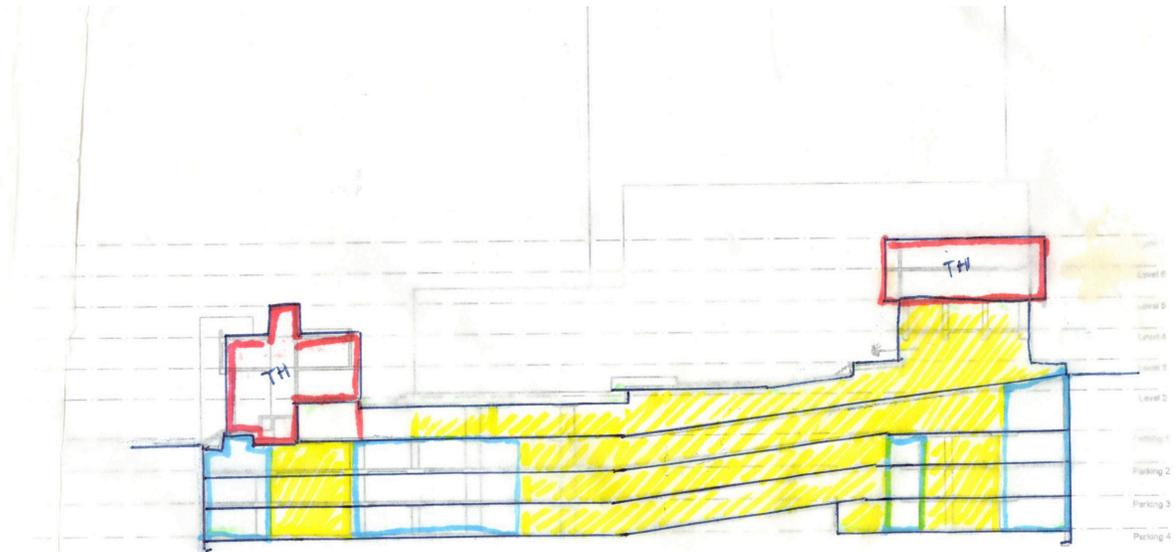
Trace paper sketch overlaid on North-South section through Beach Ave ramp. Yellow indicates existing drive aisles. Blue is parking stalls. Red shows townhouses.
